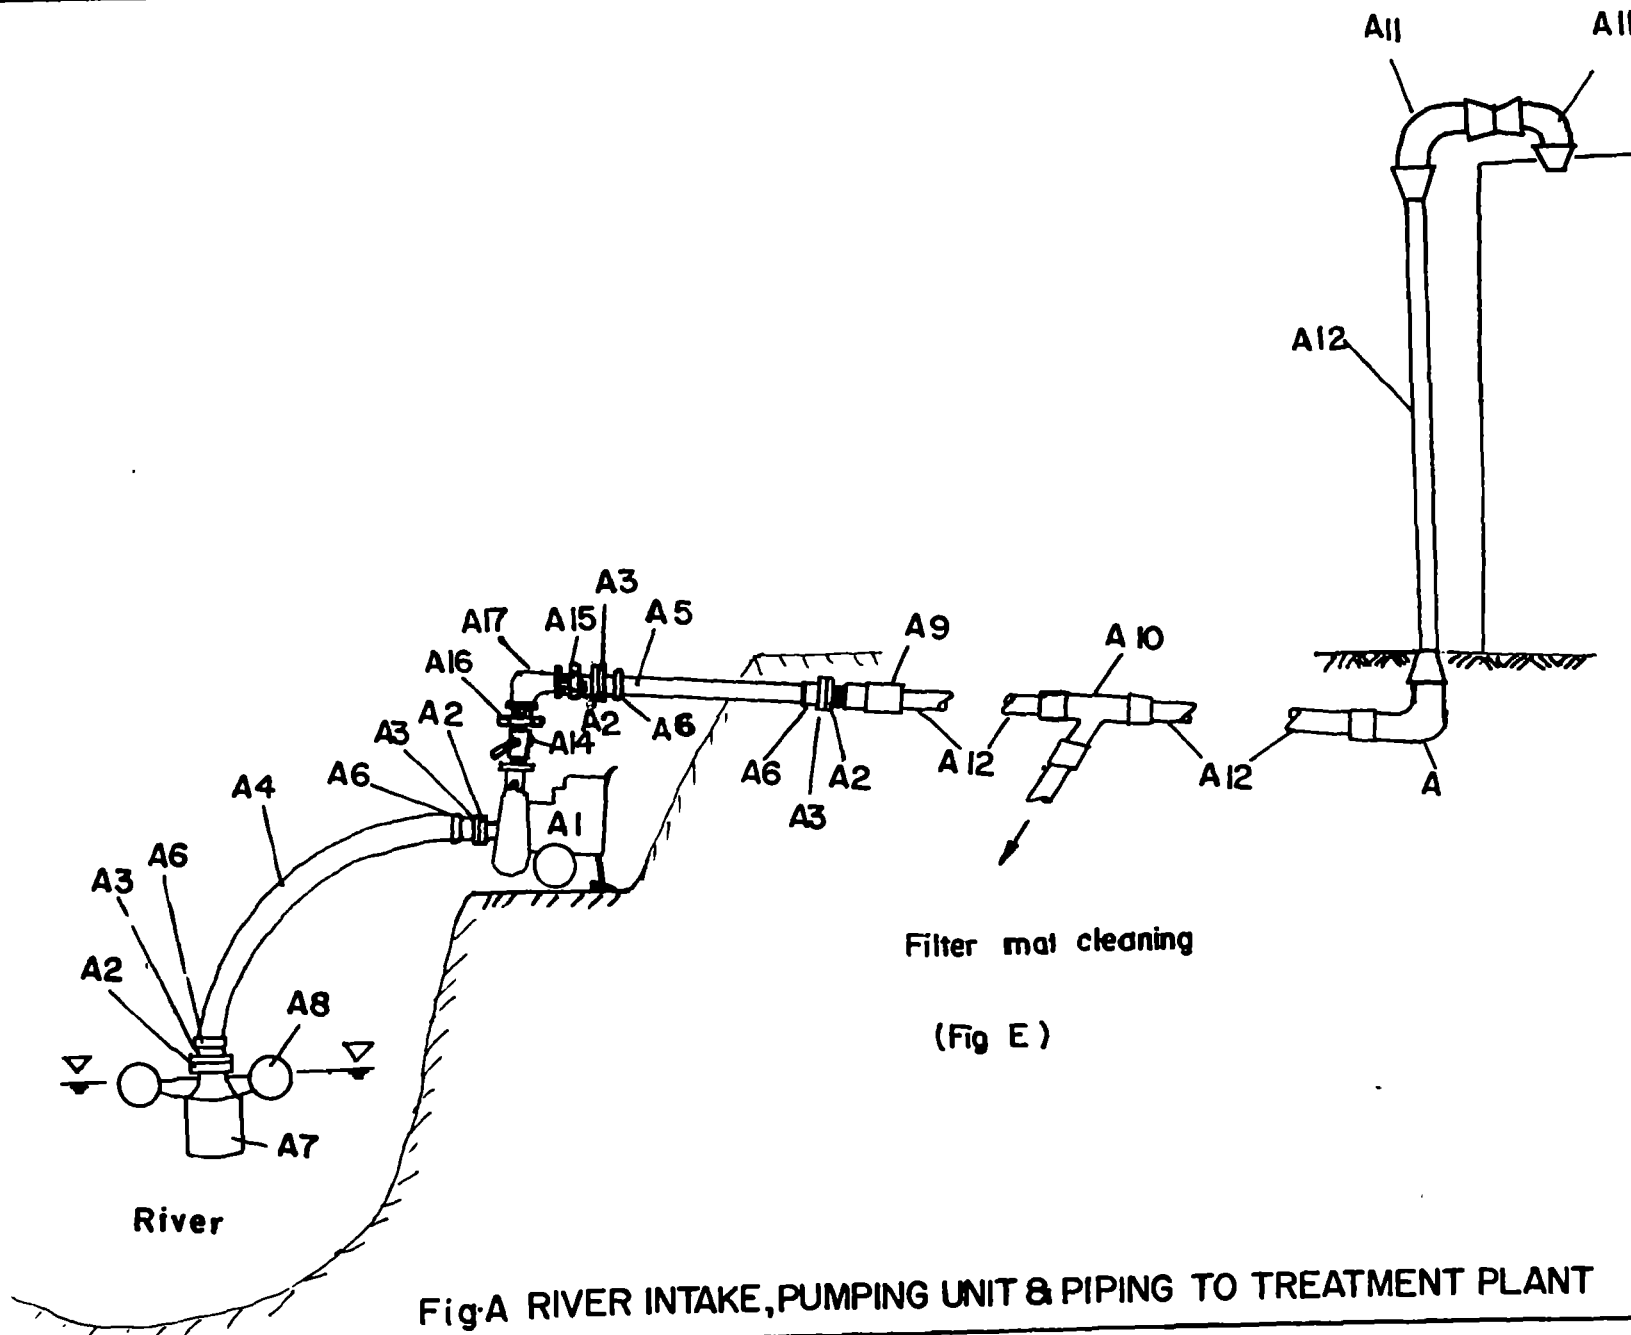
Fig A RIVER INTAKE, PUMPING UNIT & PIPING TO TREATMENT PLANT
